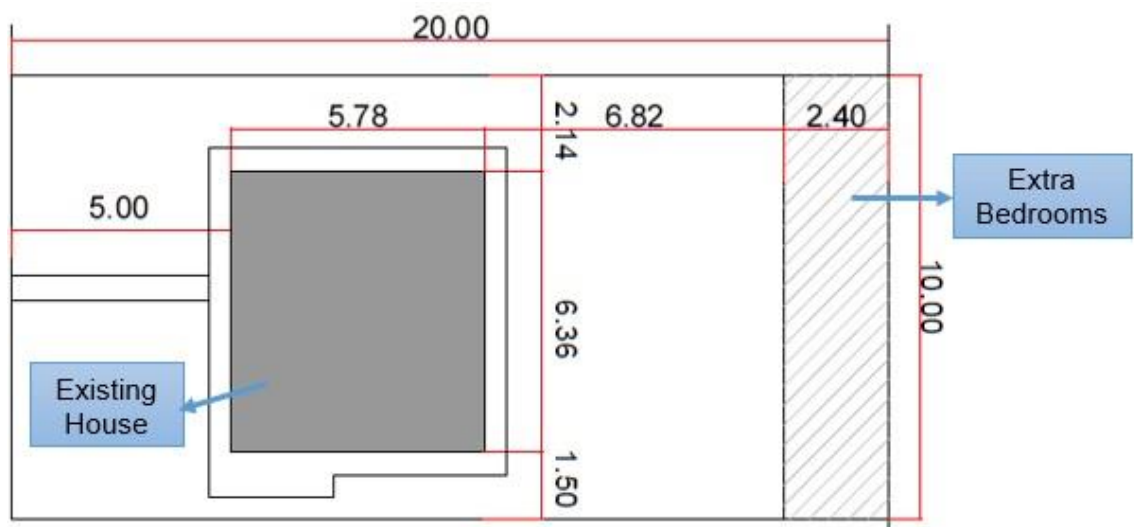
House plot with bedrooms built to the boundary walls of the backyard.
